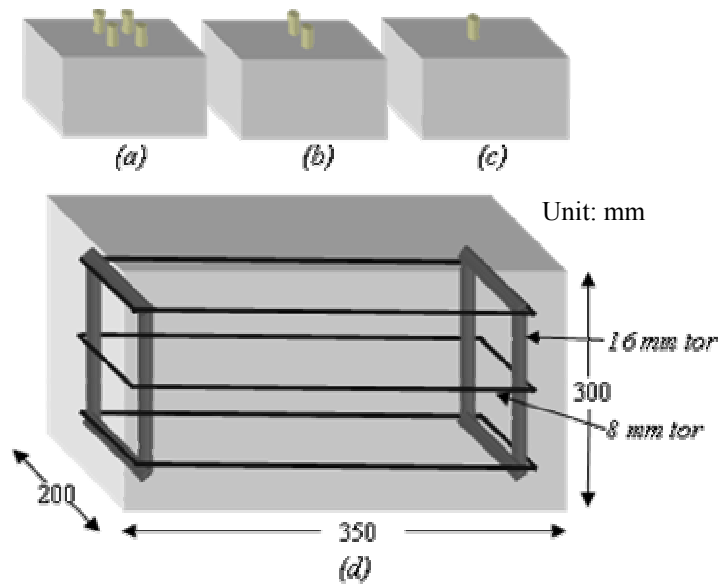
Specimens used: (a)-(c) location of anchors in specimens; (d) dimensions of specimen and reinforcement
